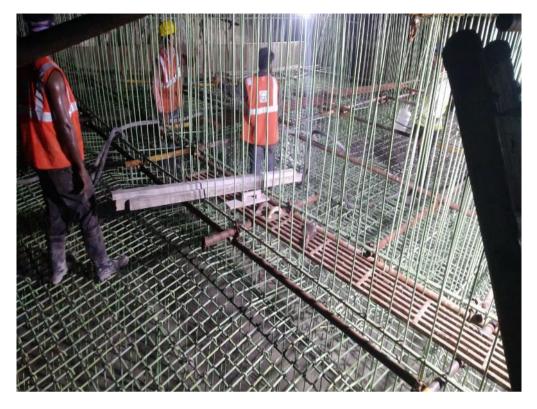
LMP A2 Abutment Foundation concrete pouring in progress
